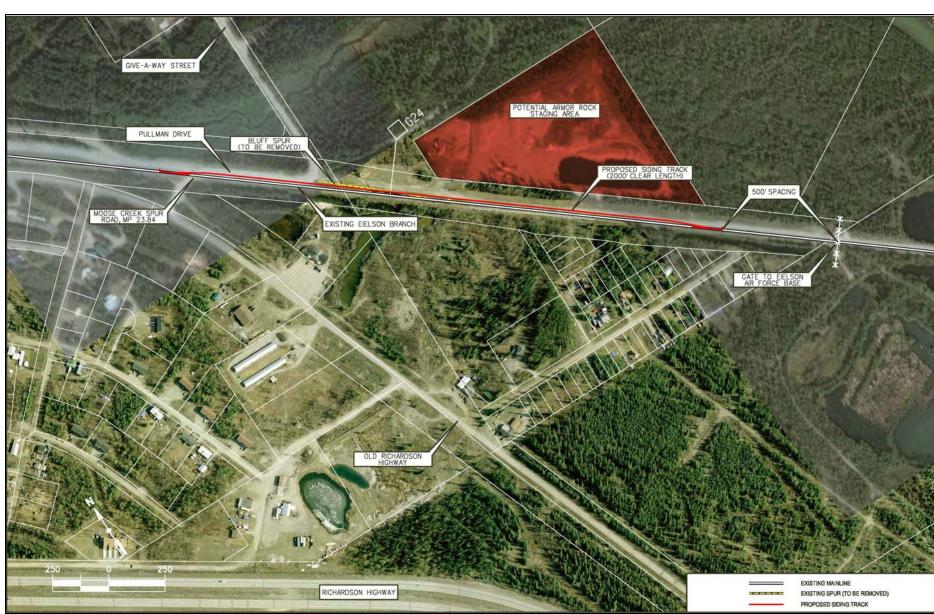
ARRC's Preferred Transload and Staging Site
